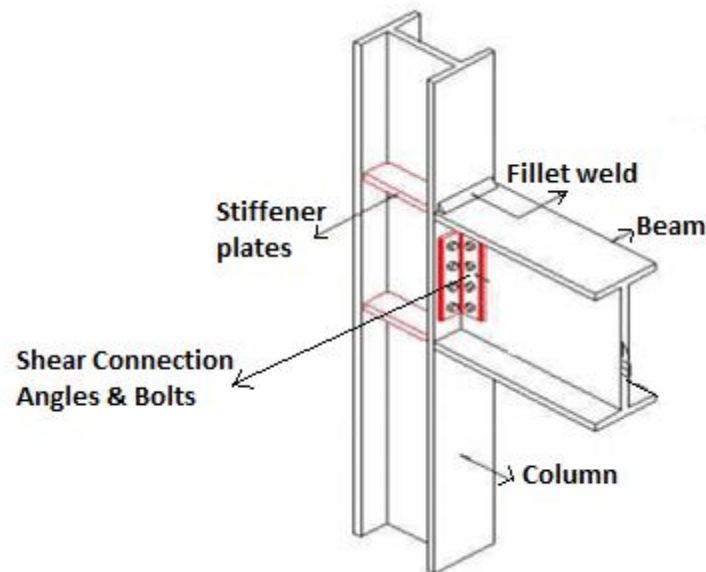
Detail of moment and uplift resistant (rigid) connections
